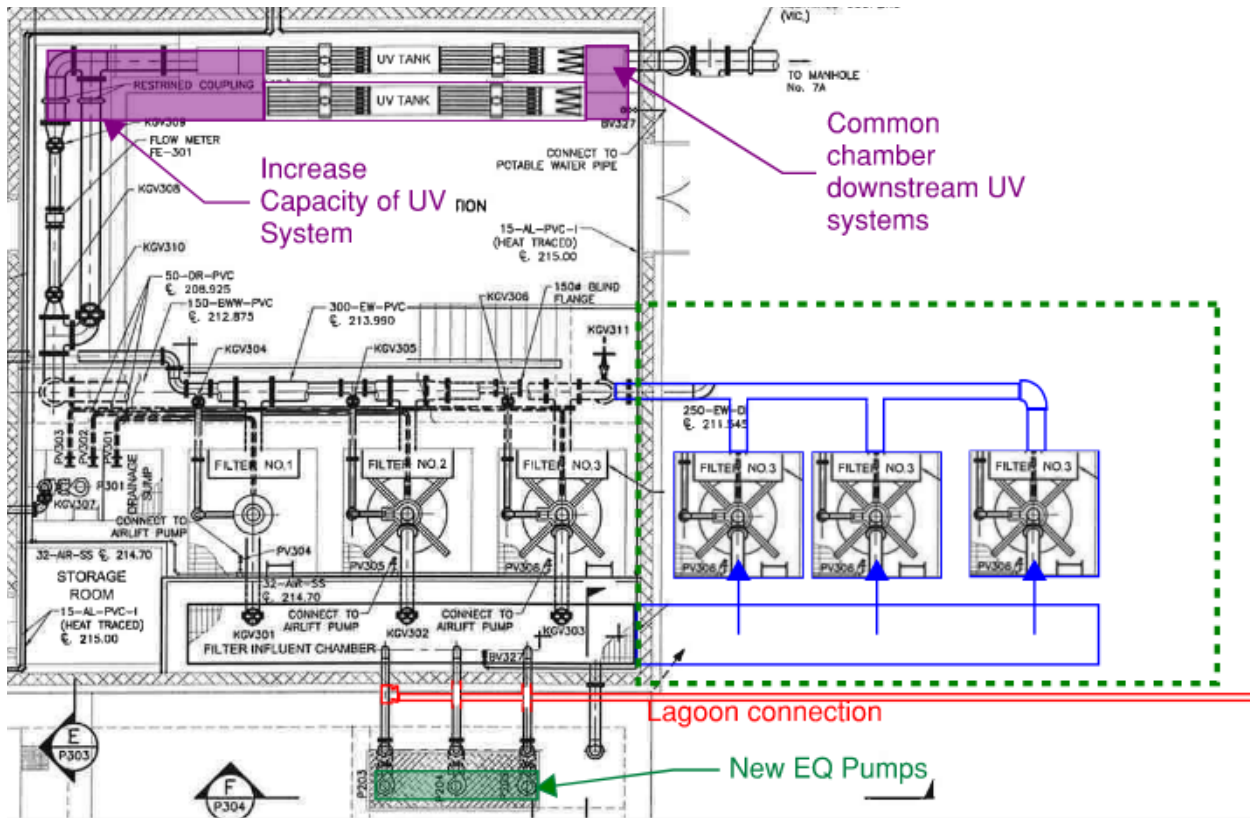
Conceptual Layout of Operation and Control Building Extension – Design Concept 3
